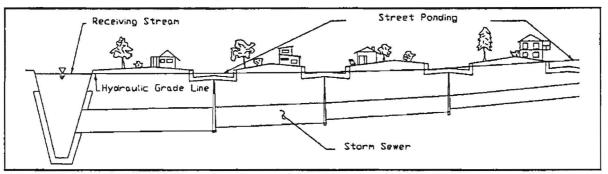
Effect of Low Starting Elevation on Storm Sewers
